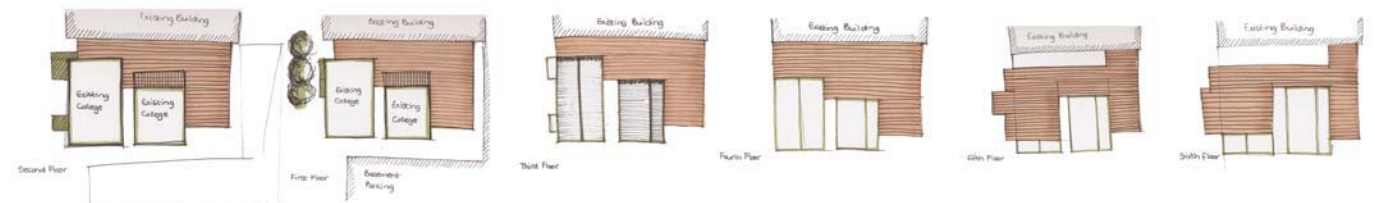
Floor plans of first to sixth floors of proposal on Site 1
